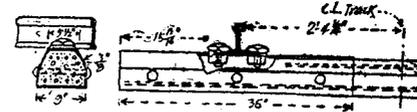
ATWOOD TIE HAS TWO STEEL BOXES EMBEDDED IN CONCRETE
